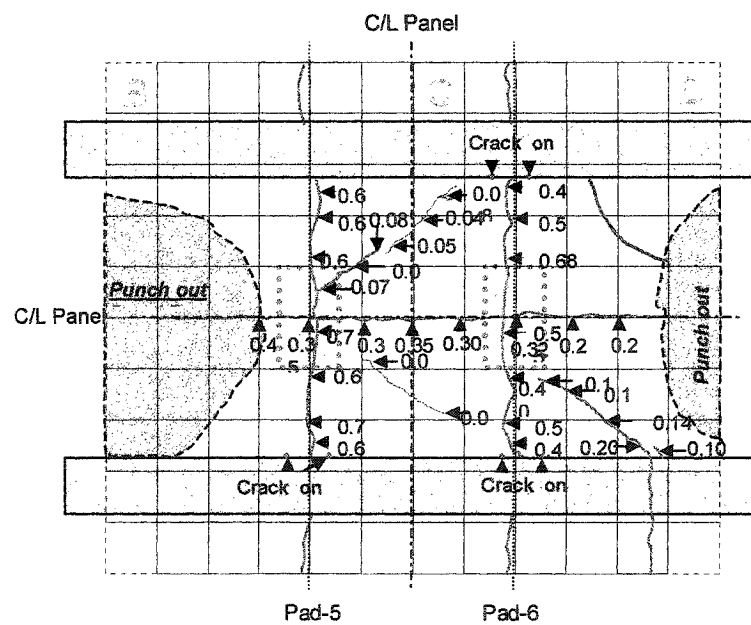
Panel-C: Crack Patterns on Soffit at Test Start
